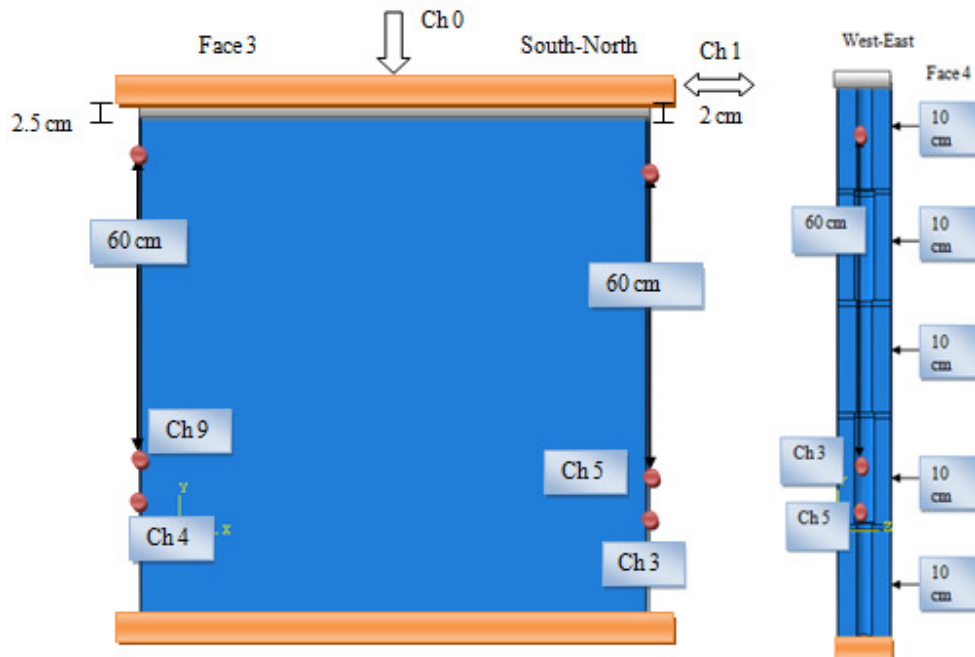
Dimensions and LVDTs Configuration of NCMWR Wall
